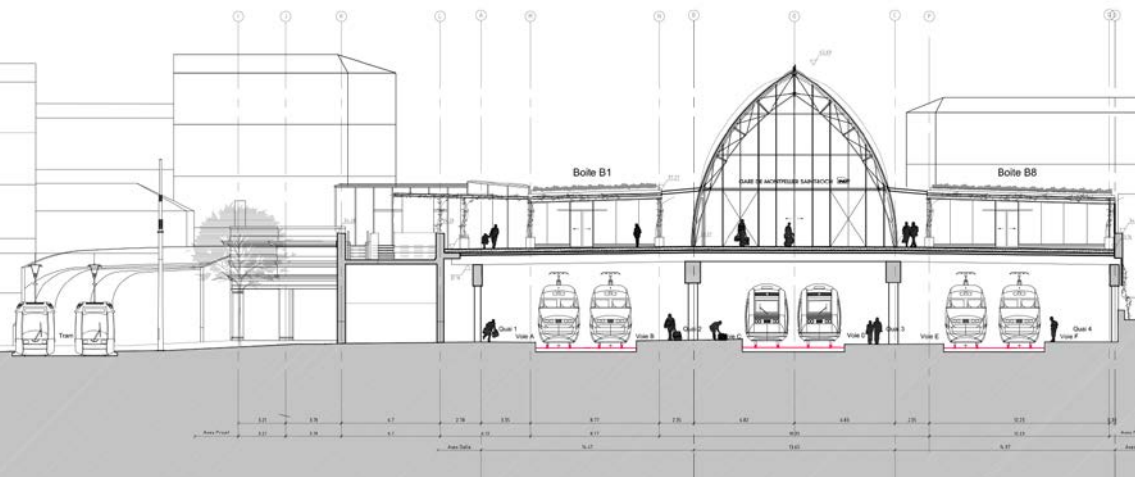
Transversal elevation of the new facade of Montpellier Saint-Roch, on top of the tracks
